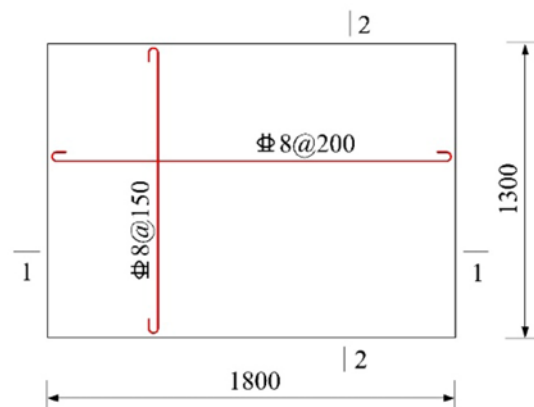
The Section View of Reinforcement of Slab (unit: mm)
